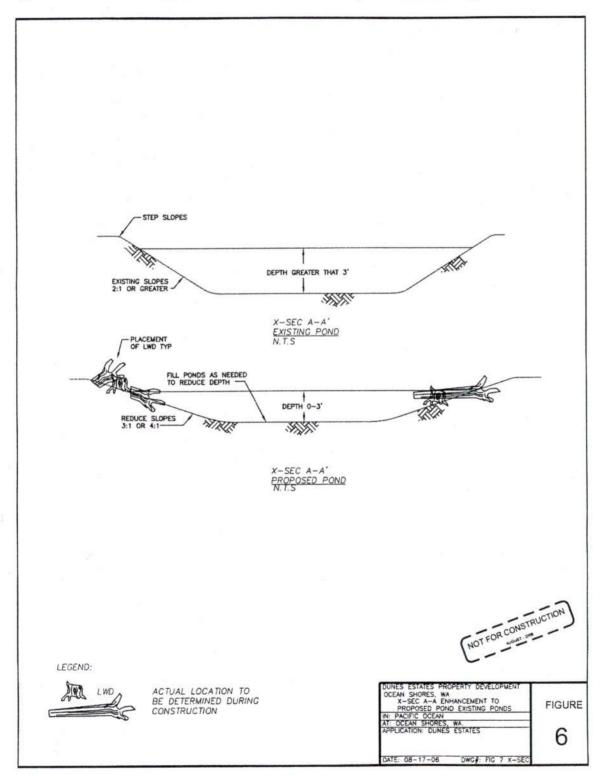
Cross-section A-A Enhancement to Proposed and Existing Ponds
